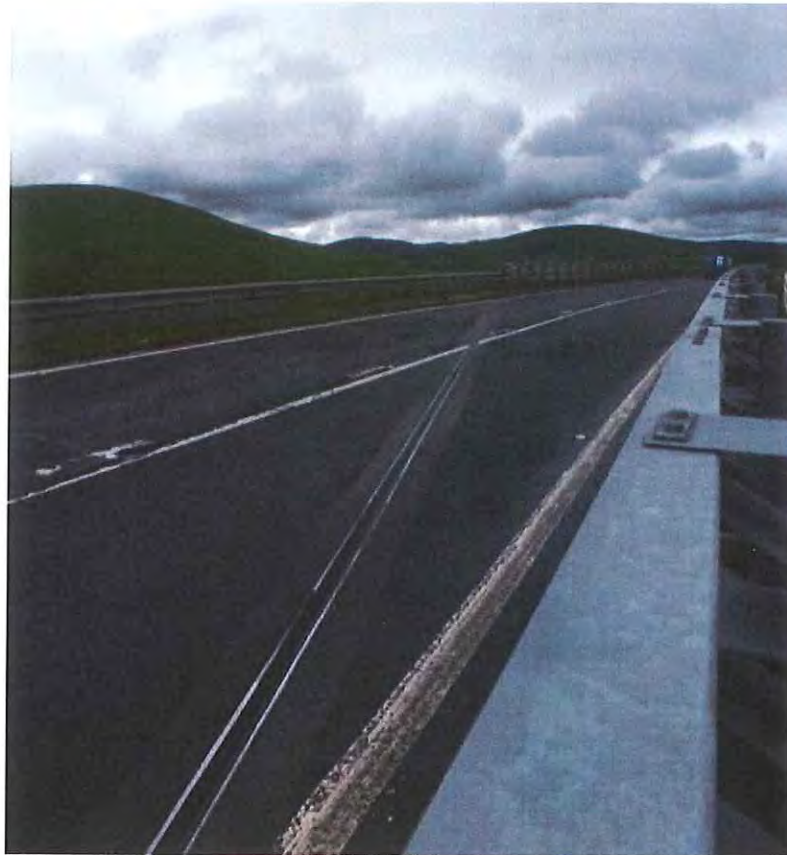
View of Eastern Joint – Taken from edge of Northbound carriageway looking South-West
